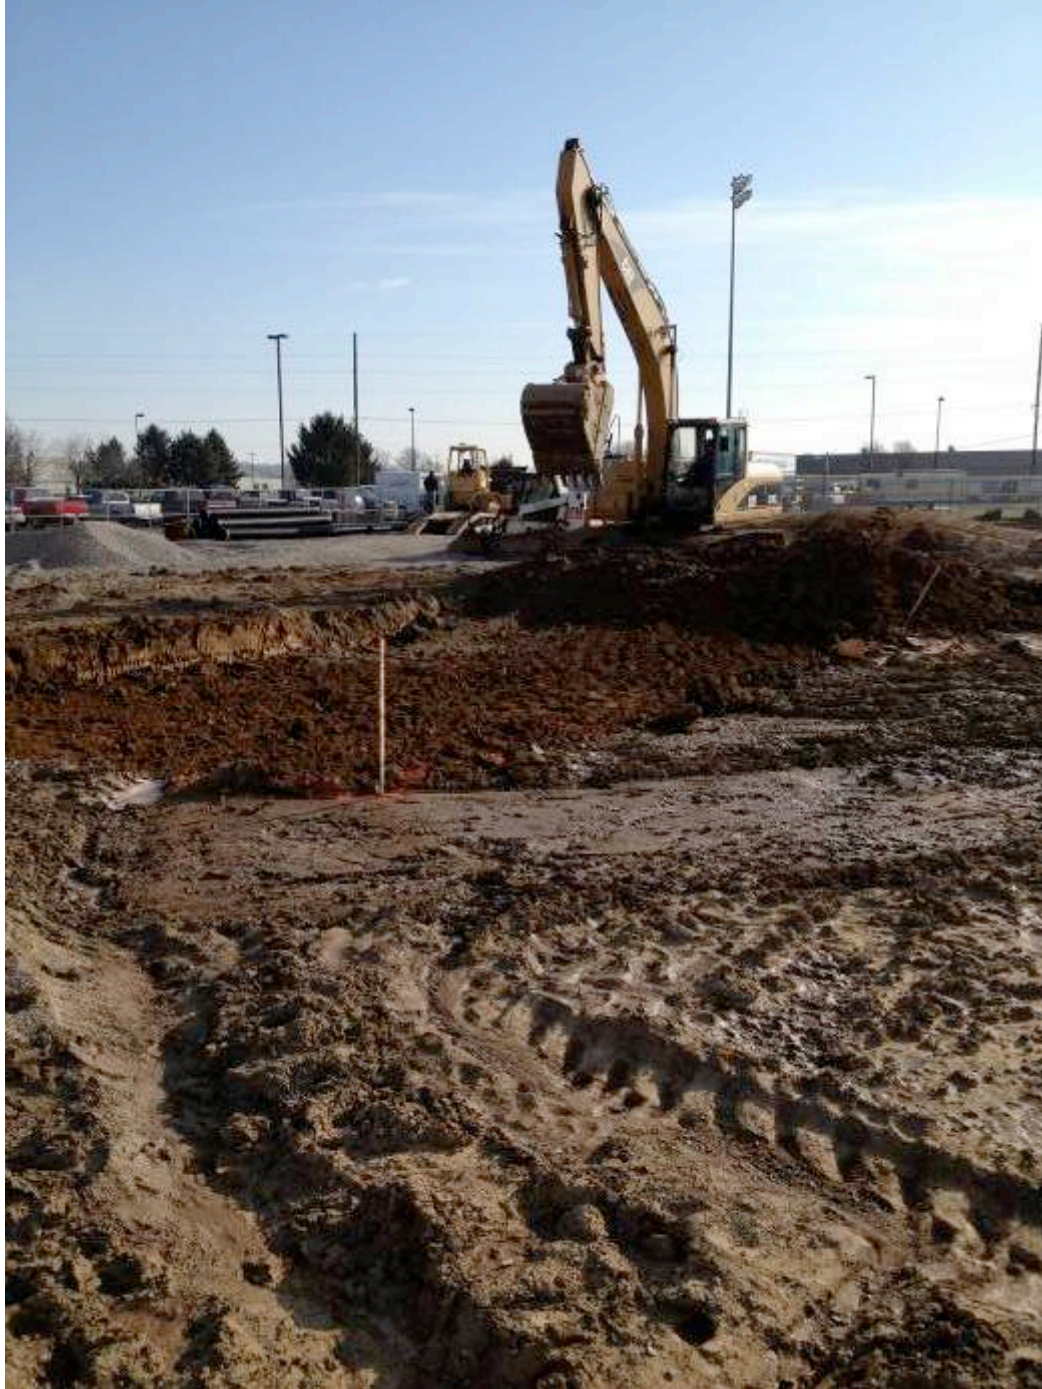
Excavation of Soft Area via Caterpillar 320C Excavator
